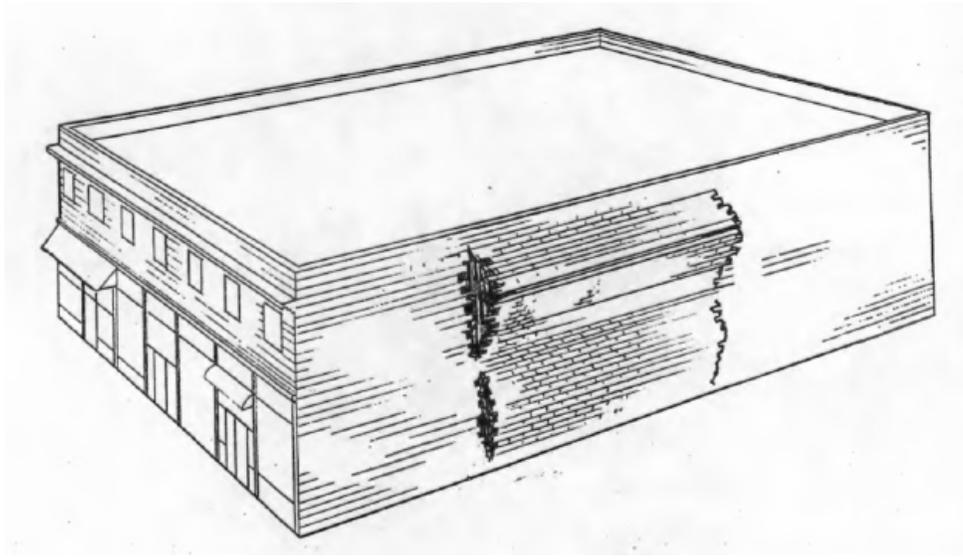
Illustration of Out-of-Plane Wall Failure
